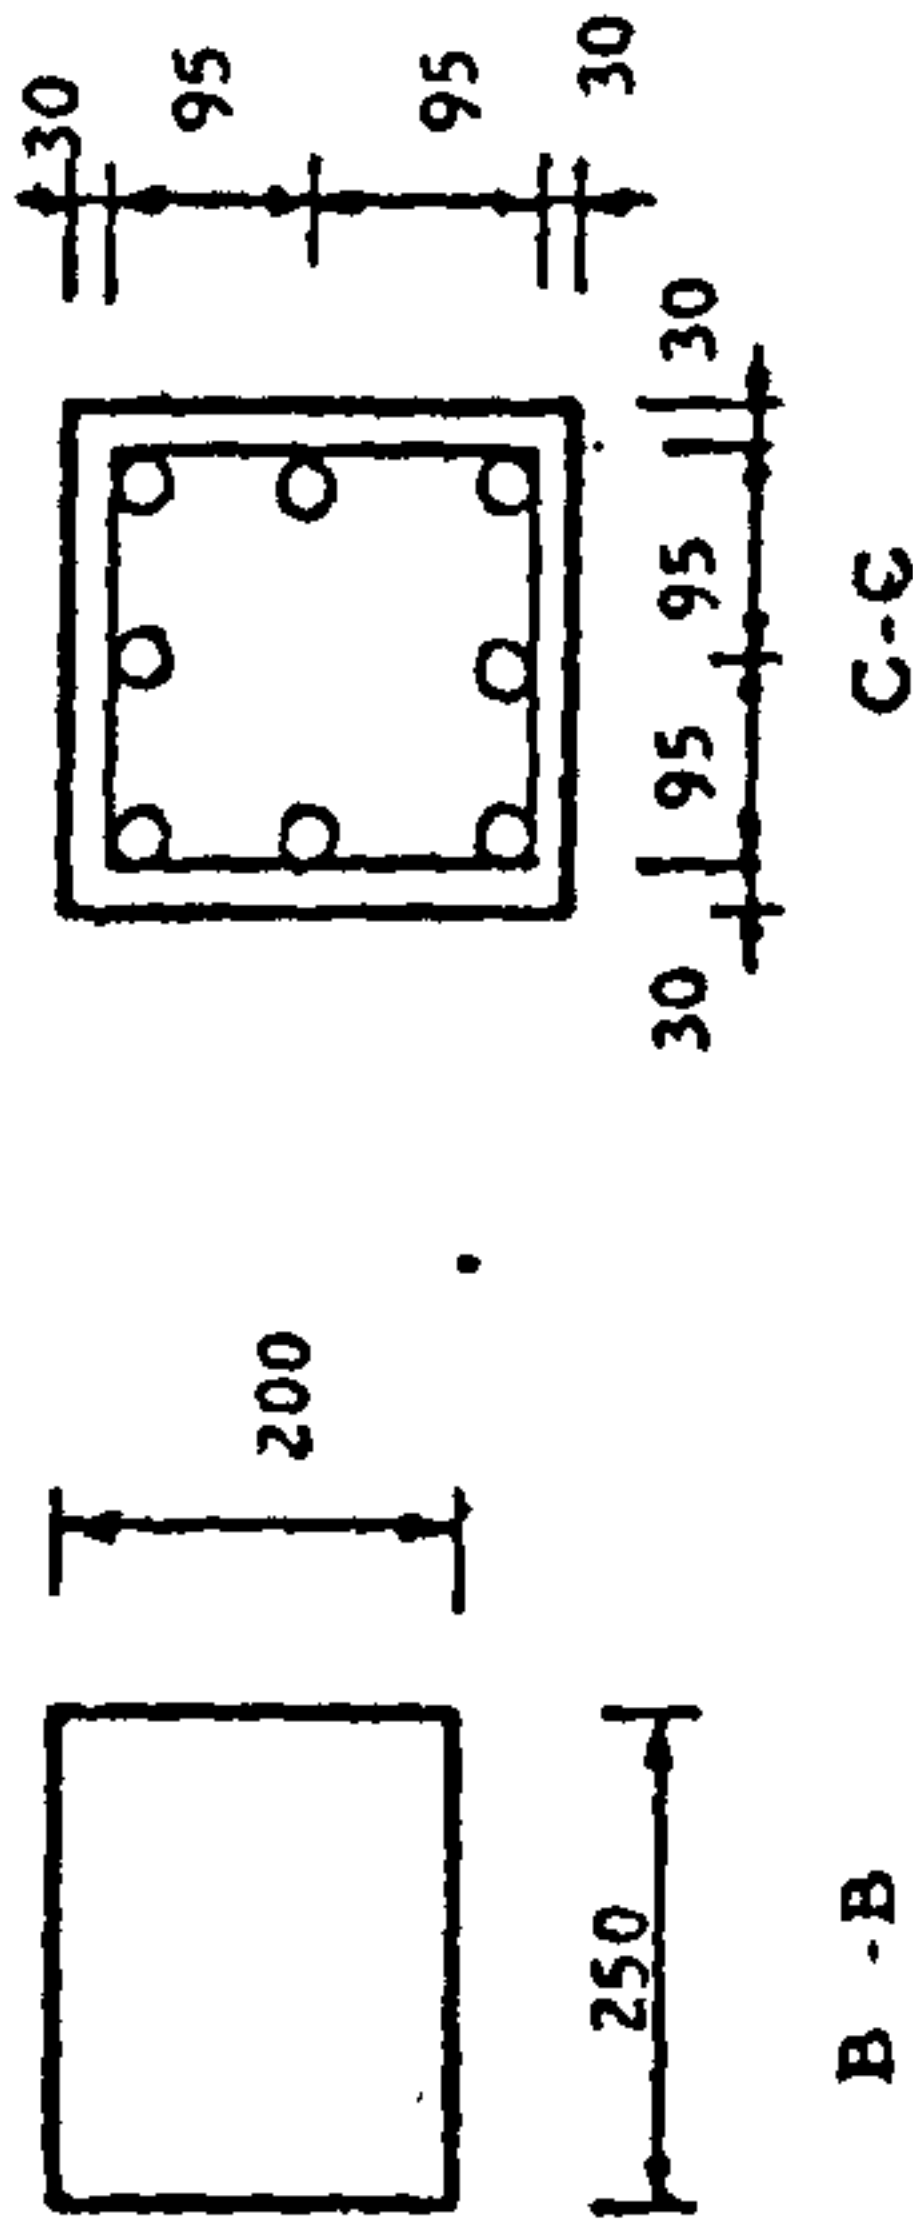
Reinforcement details for columns MDU0-03/05
